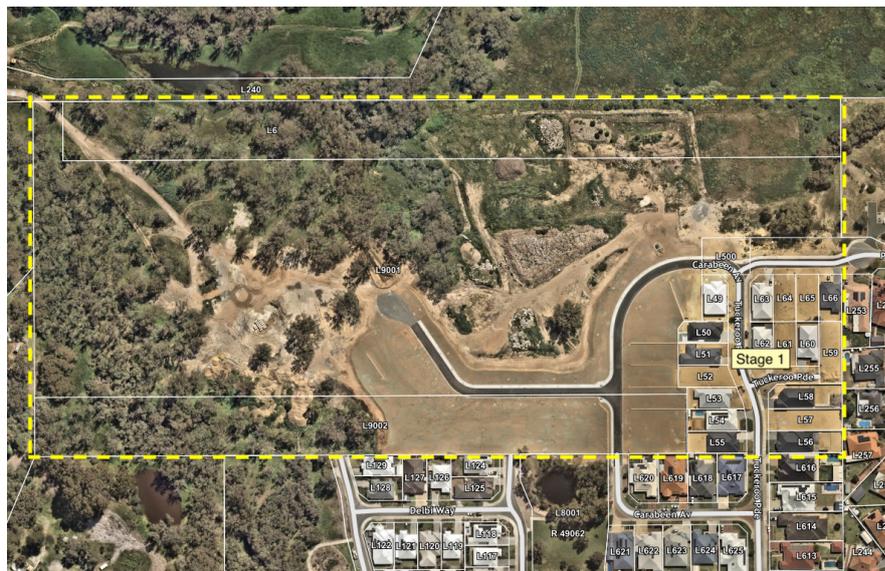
Aerial showing first stage of subdivision completed in western portion with dwellings constructed on the new lots.
